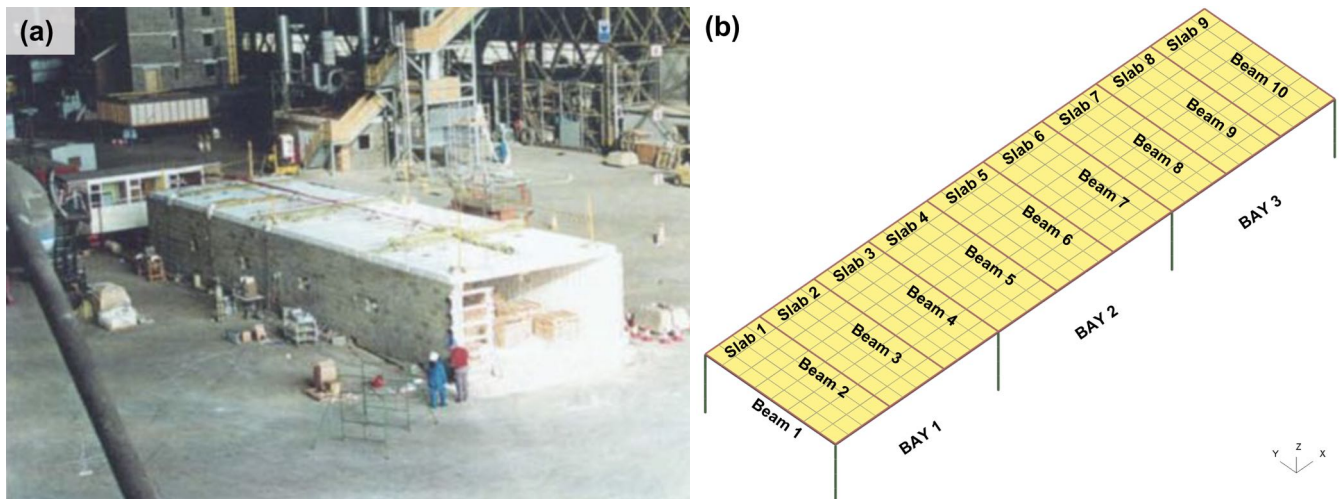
(a). Test compartment of the BST/FRS 1993 Fire Test Series [20]; and (b). 3D finite element model of the new adapted prototype building (beams and slabs tagged in the following sections).
